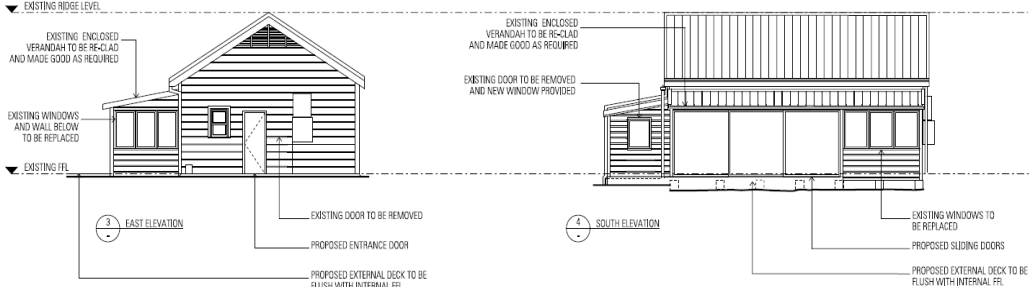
Proposed Green Point Cottage (east and south elevations)
